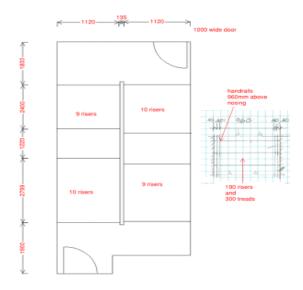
Diagrammatic Plan View of Stair 1 Christchurch Building (Represents M4)
